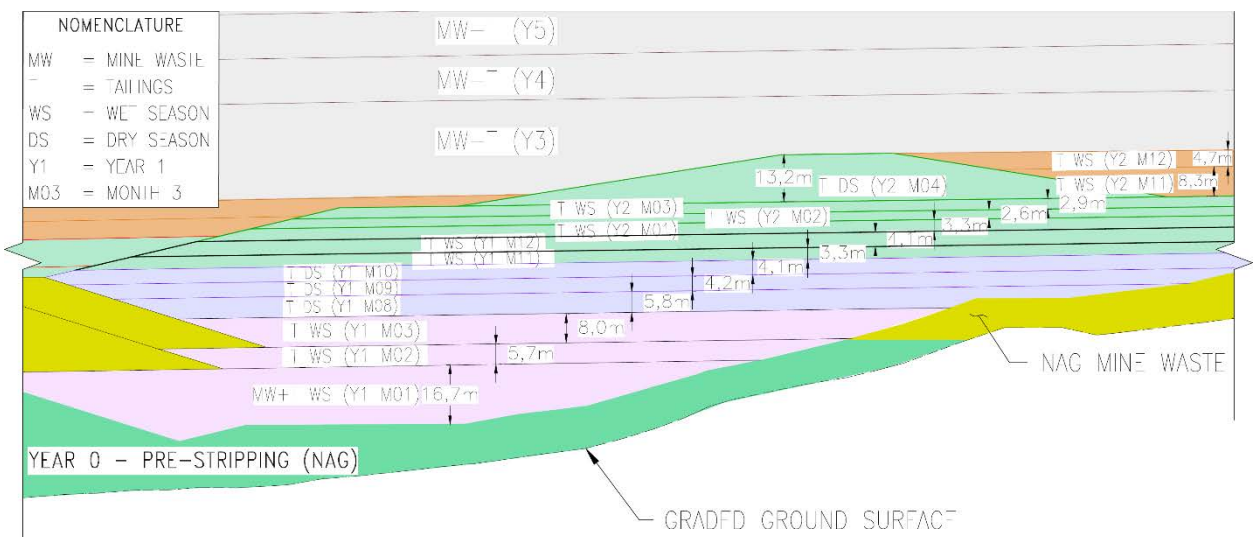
Mine waste-filtered tailings co-disposal - Zone B
